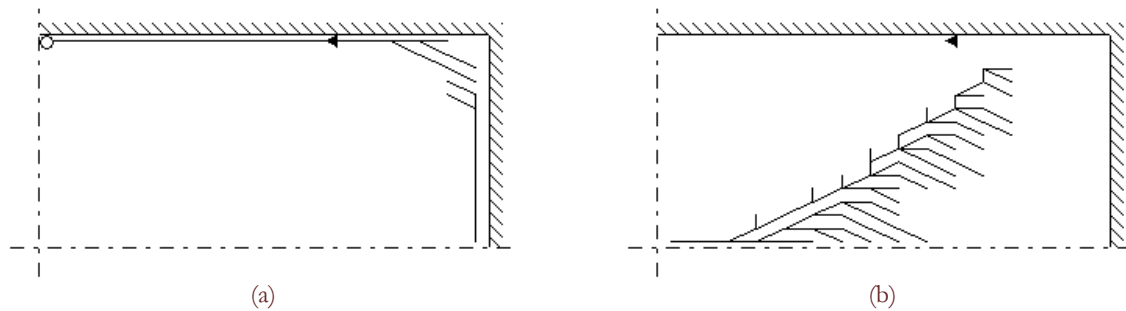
Crack patterns on upper (a) and lower (b) surfaces of a 3D plate without initial damage.
